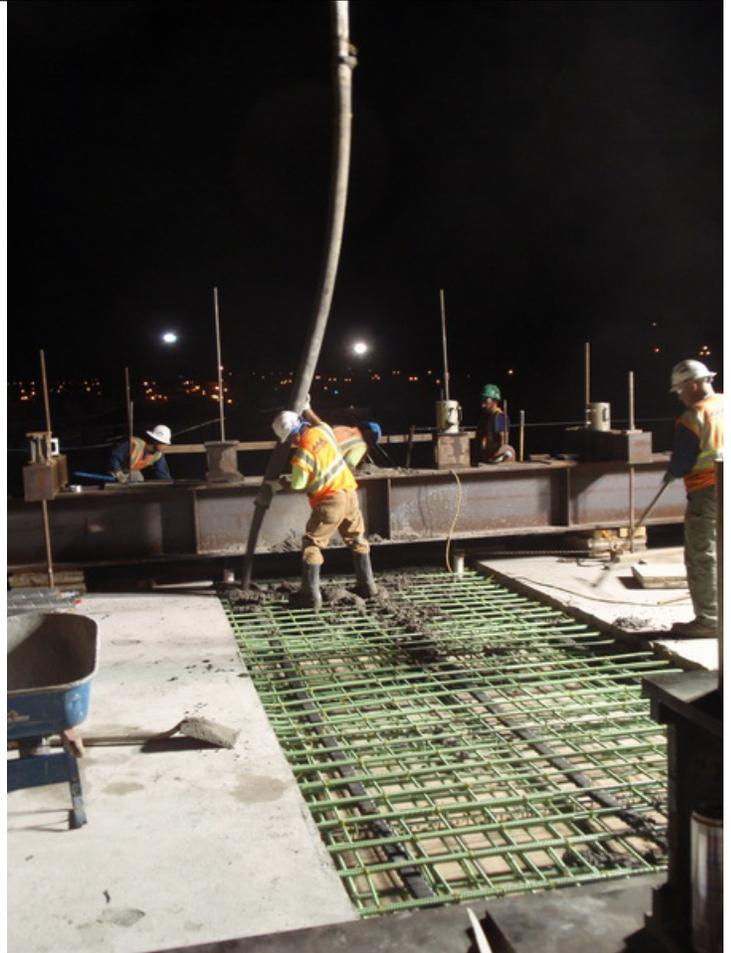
Abutment 6 EB Approach Slab Construction – September 30, 2010:
